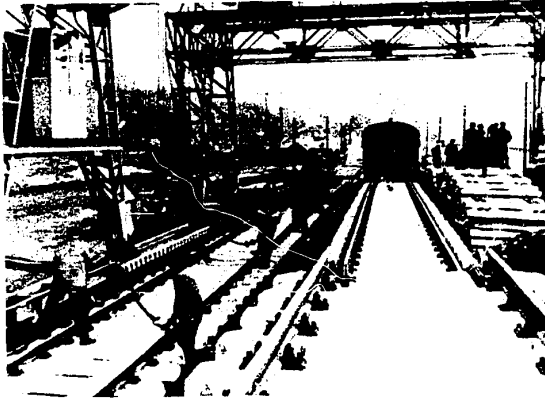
Prefabricated track sections being used in modernization work (U/OU)
